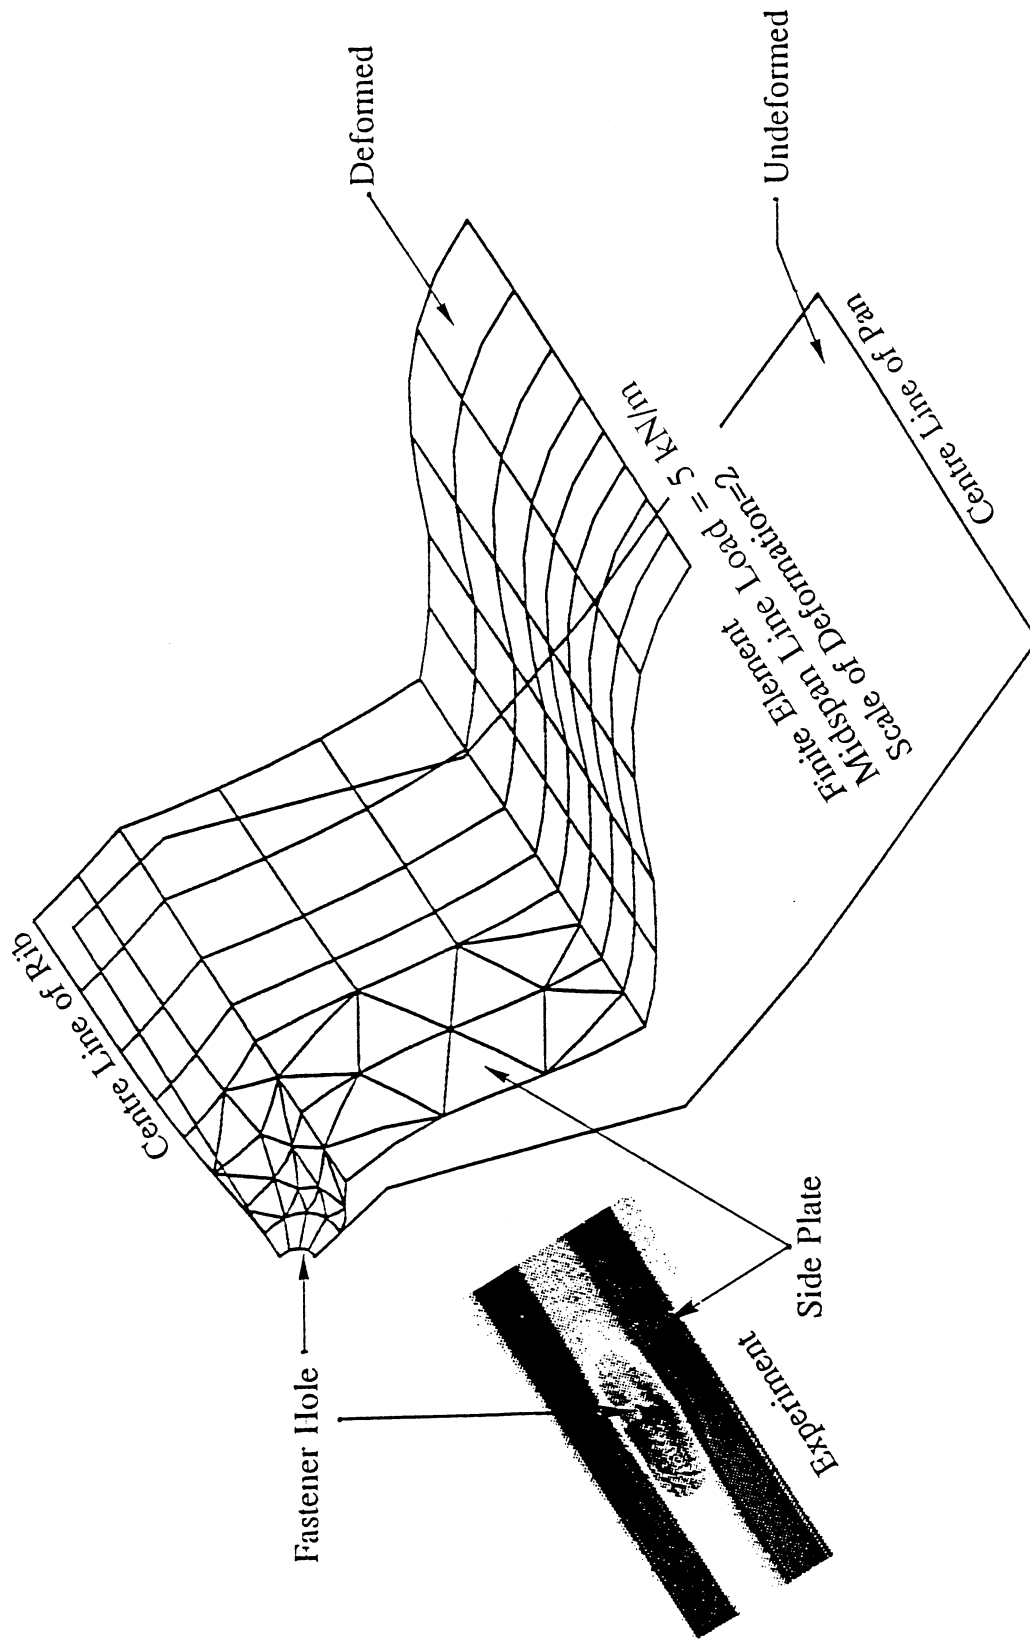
LOCAL DEFORMED SHAPE AROUND CENTRAL SUPPORT FASTENER HOLE: RIBBED PROFILE ROOFING SHEET
